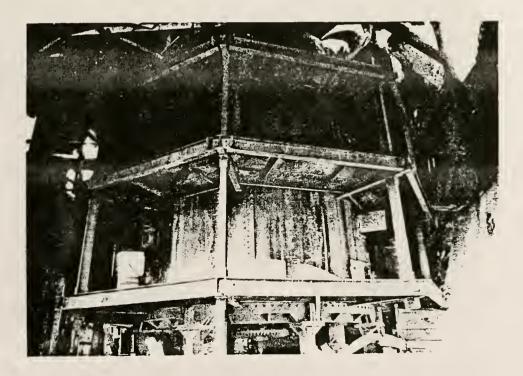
Arsenic plant (structure #59) showing McDougall roasting furnace, north view.
